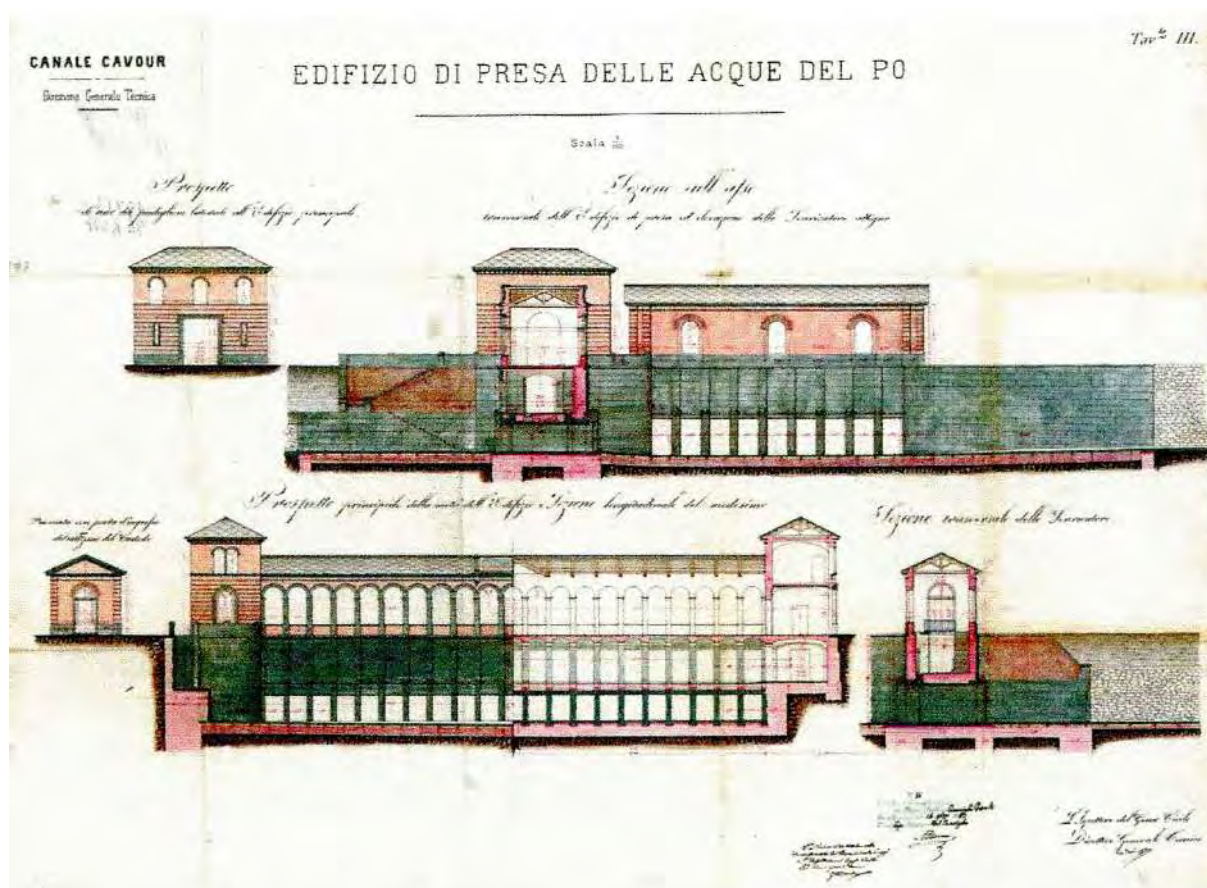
Entrance building of the waters of the Po into the Cavour Canal: elevations and sections. Historical Archives of the Waters and Irriguable Lands 'Historical Archives of the Cavour Canals', drawing no. 2171 (source: Baratti Claudia, 2011/2012).
